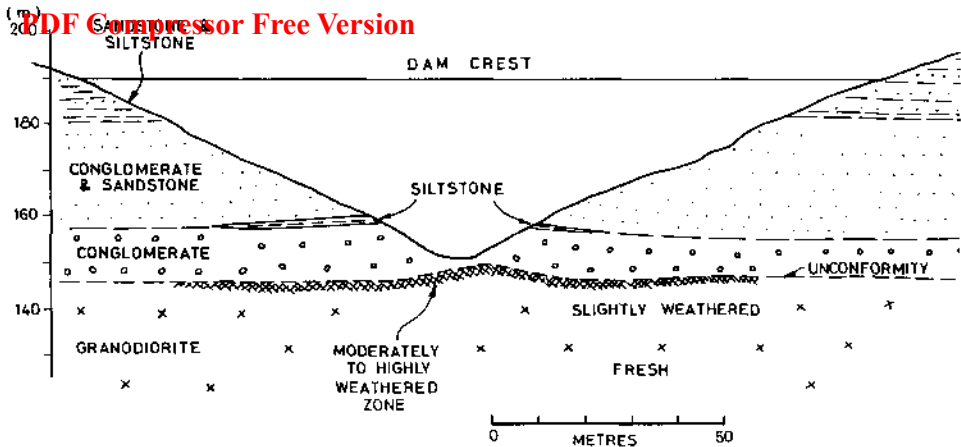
Cross section at Yellow Pinch Dam, New South Wales, showing buried land surface with weathered zone.
